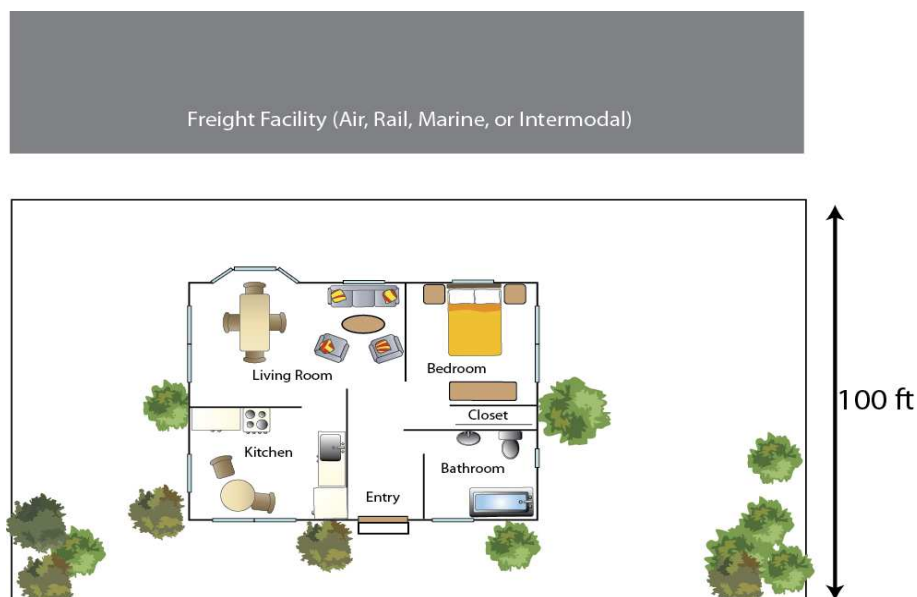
IMPROVED RESIDENTIAL DESIGN LAYOUT ACCOMPANIED WITH NON-ACCESS EASEMENT
